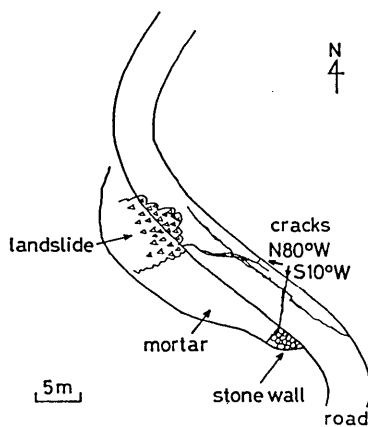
Cracks on an asphalt pavement at Loc. i (south of Omata; see Fig. 33).
